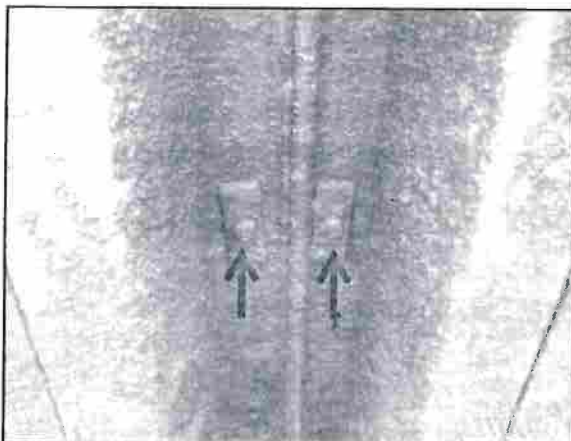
Typical through bolt and plate located along the outboard of the wall. Bolts are visible at low tide.
